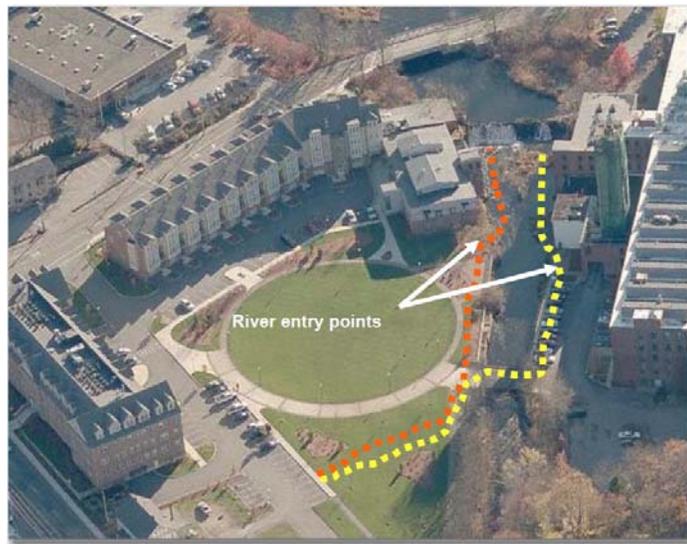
Potential primary (orange) and secondary (yellow) access for the Marland Place Dam removal. White arrows indicate river entry areas requiring temporary access ramp construction.
